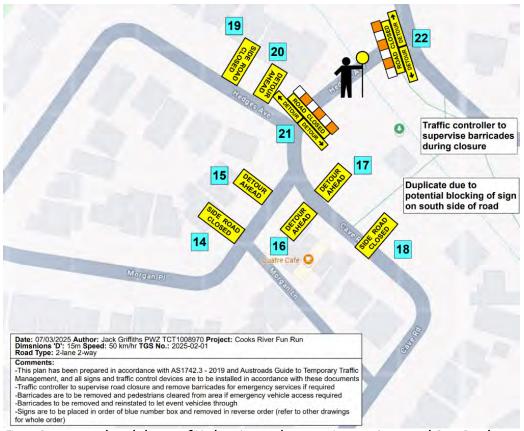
proposed road closure of Hedges Avenue between Augusta Street and Cave Road
